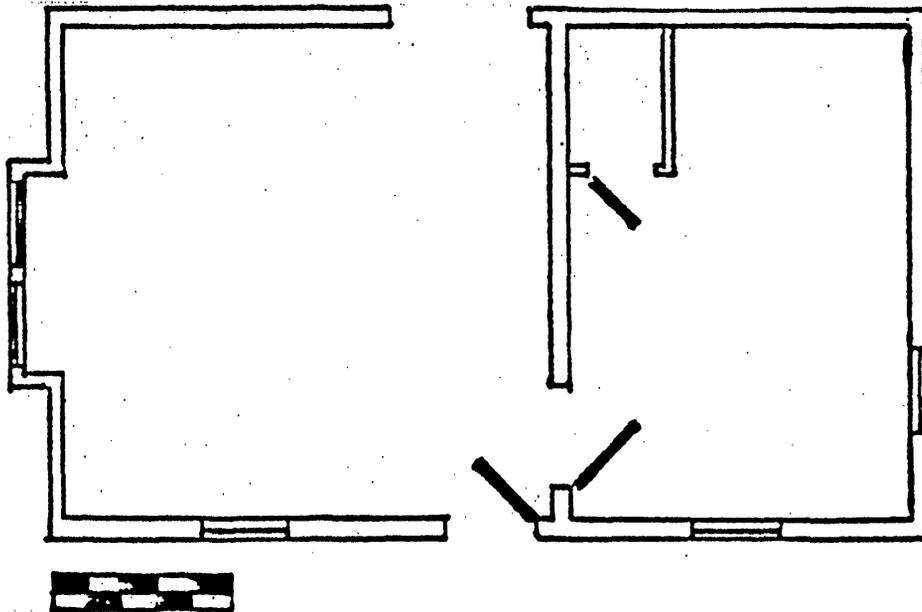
Floor Plan of Boose/Conklin House, Elk Horn, Hall-Parlor House Type.
